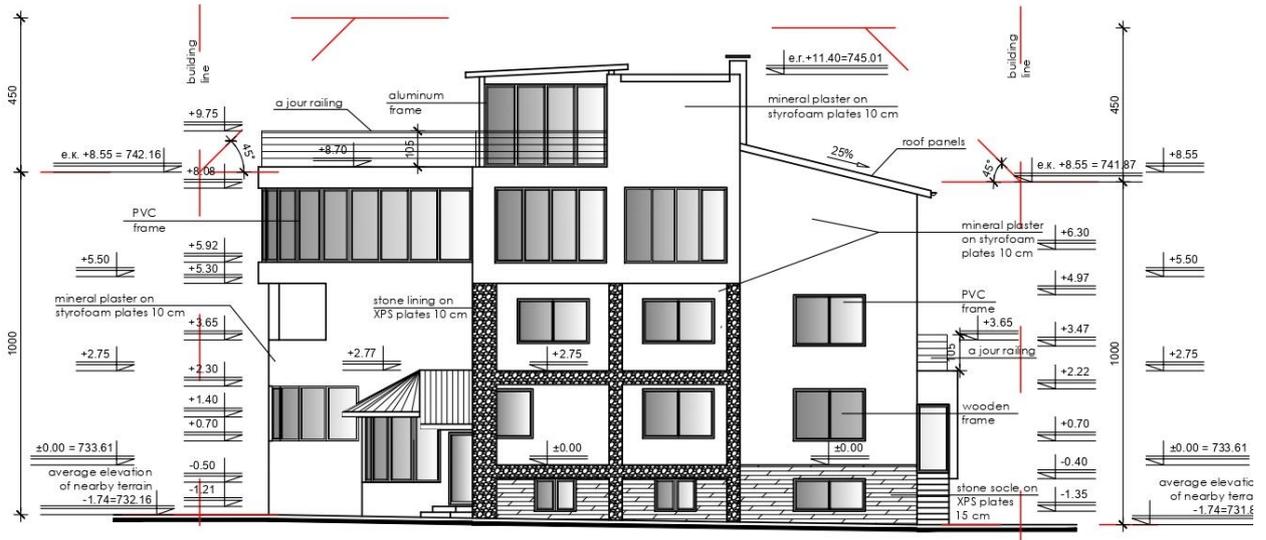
Partial Cross-section, Roof panels, 25% (Source: BAL)
